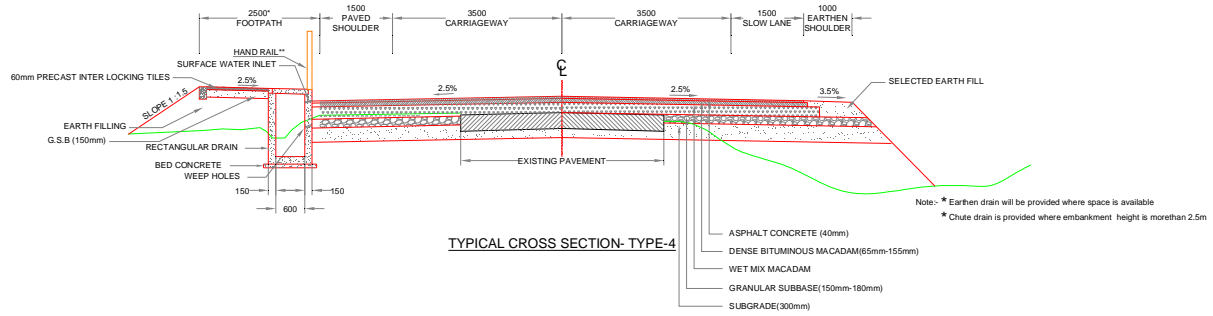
TYPICAL CROSS SECTION- TYPE-4
